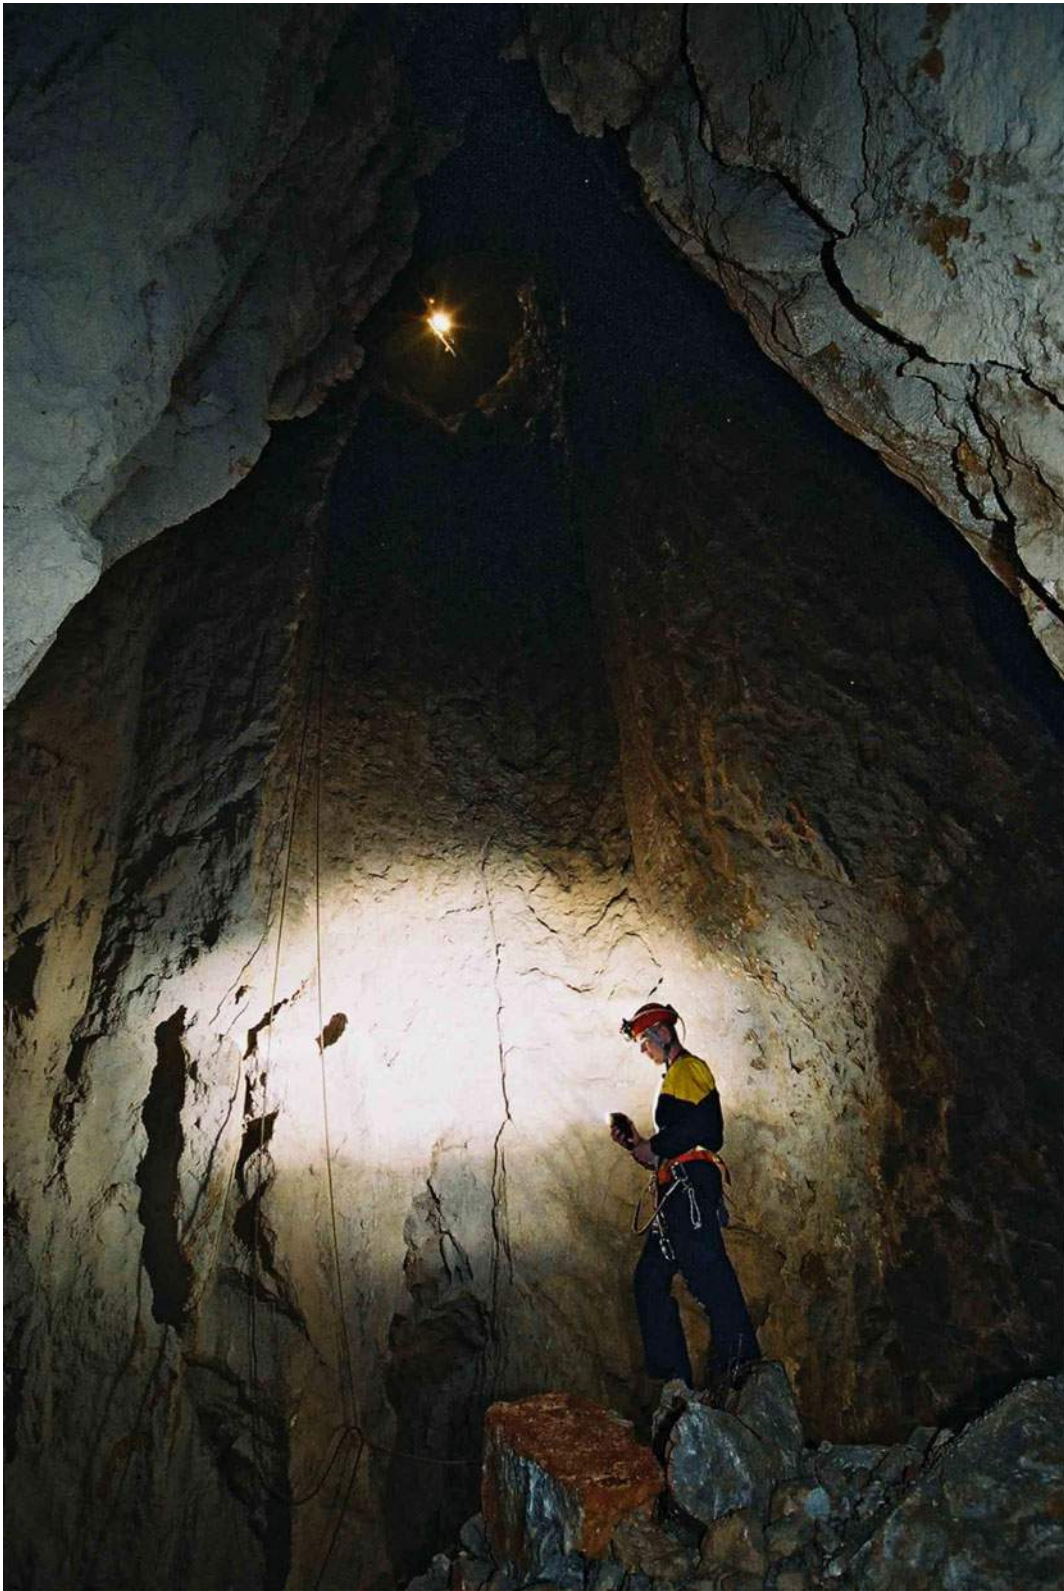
Cavern at km 14 + 964 in Brinje Tunnel
